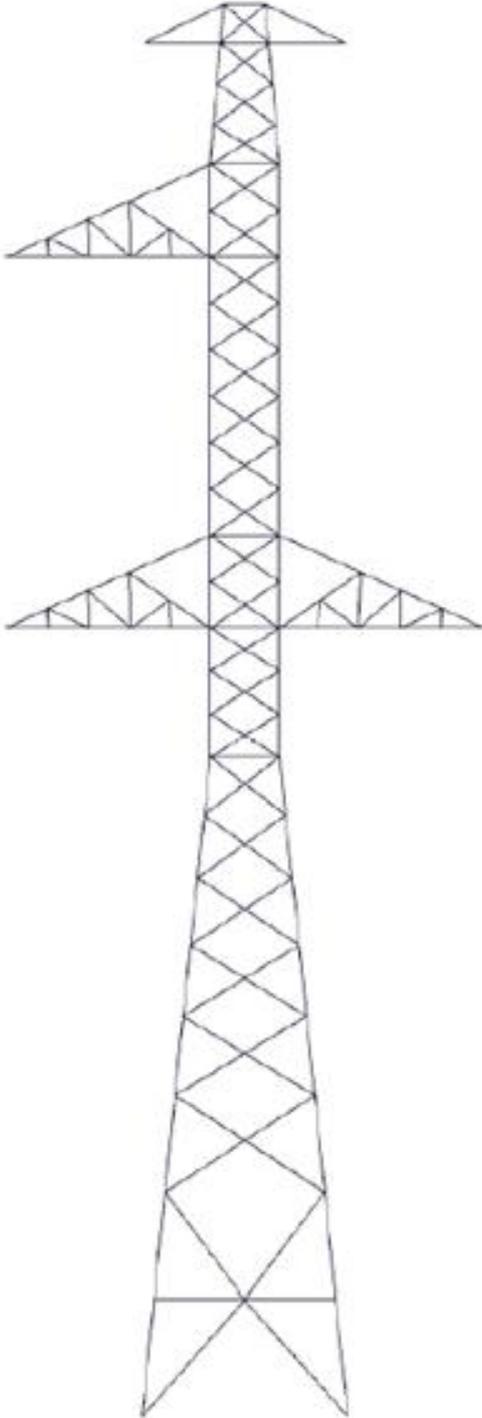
Proposed 400 kV Transposition Lattice Tower (Not to Scale) for the Proposed Development
